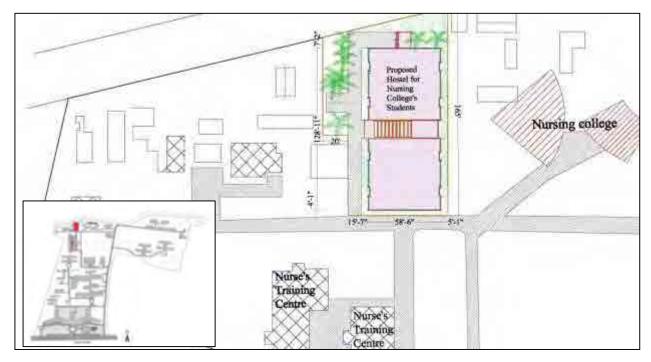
Candidate Site's Location and Layout Plan for Construction of the Nursing College in Sylhet
